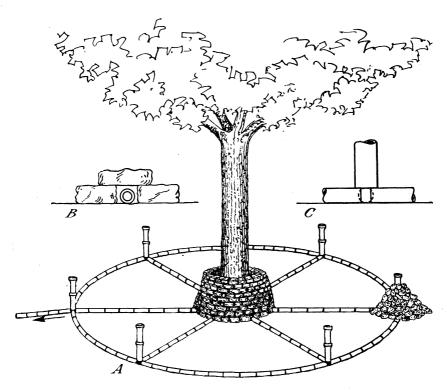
Preliminary steps in constructing a fill. A, Dry well around tree trunk to permit air and water circulation. Tiles on ground sloped so as to drain away from trunk and off the roots, as indicated by arrow. Vertical tiles connected with the drain will permit additional air circulation; the one on the extreme right is held erect by loose stones. B, Protecting arch of stone placed over drain tiles to prevent breakage. C, Vertical tile resting on the ends of horizontal tiles that are spaced to allow circulation.
